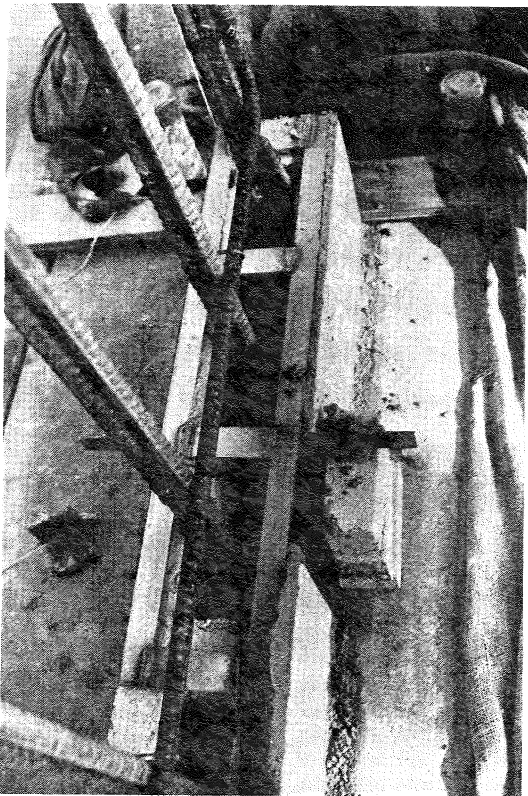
CONFINING PLATE IN MORTAR BED OF WALL 2
